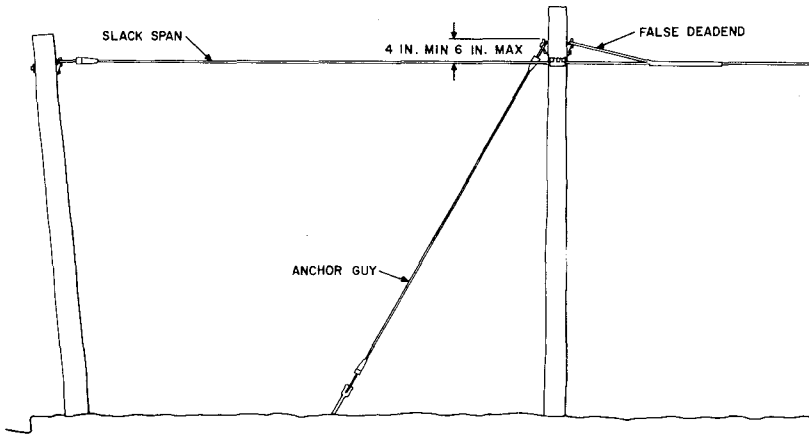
Anchor Guy Installed for Slack Span Construction
